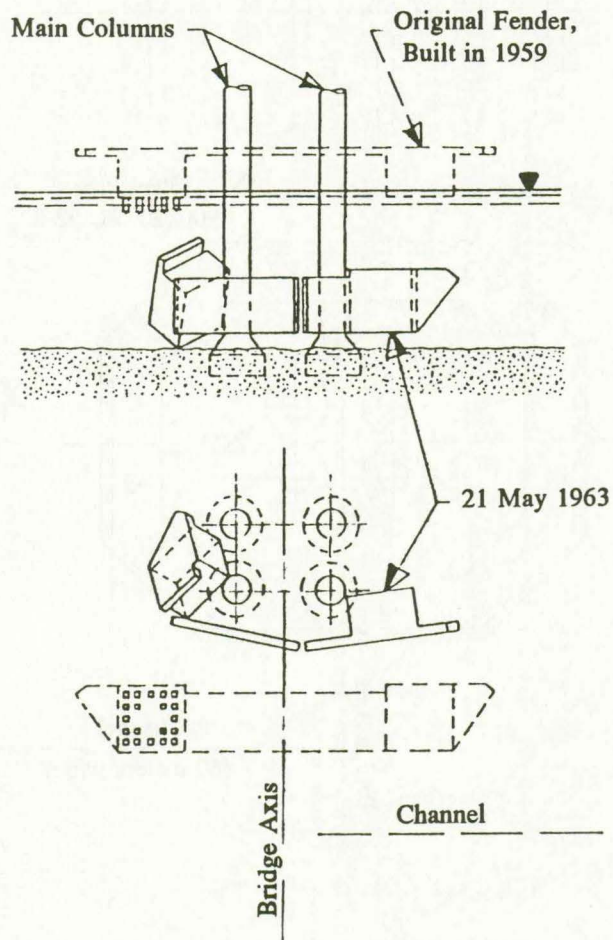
Detail of Destroyed Pile Supported Fender of the Tromso Bridge due to a 1963 Ship Collision [11].
